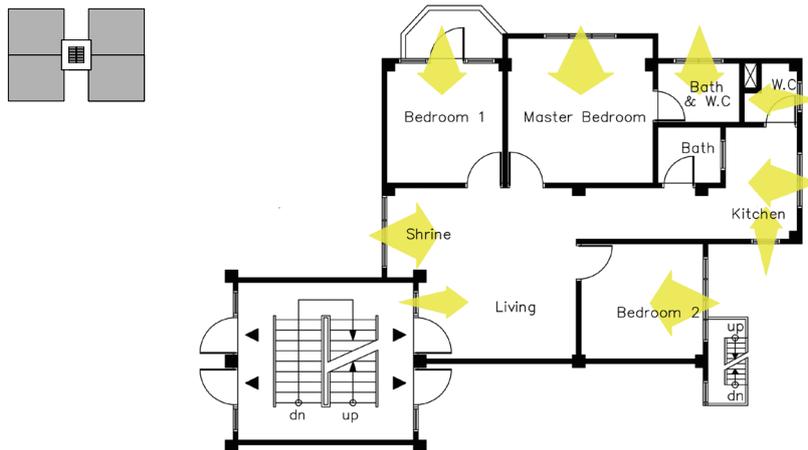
Room depth and the penetration of lighting in central stair type apartment
